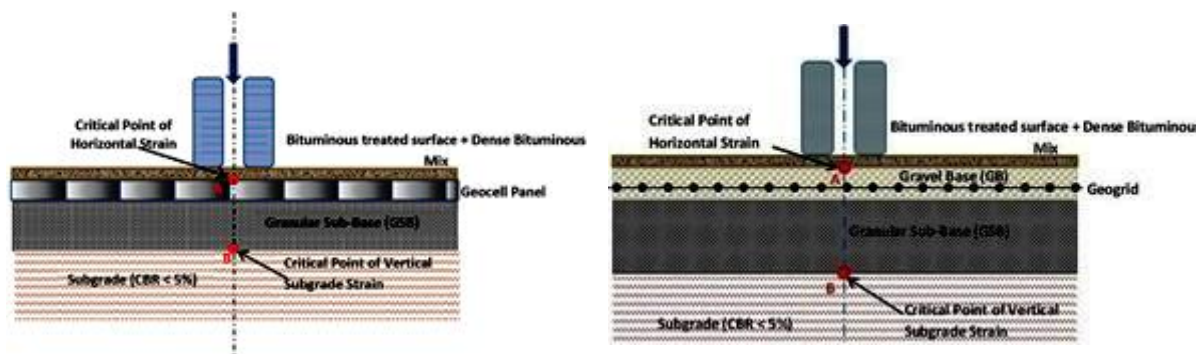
(a): Geocells in pavement section      Fig. PV-4(b): Geogrids in pavement section
